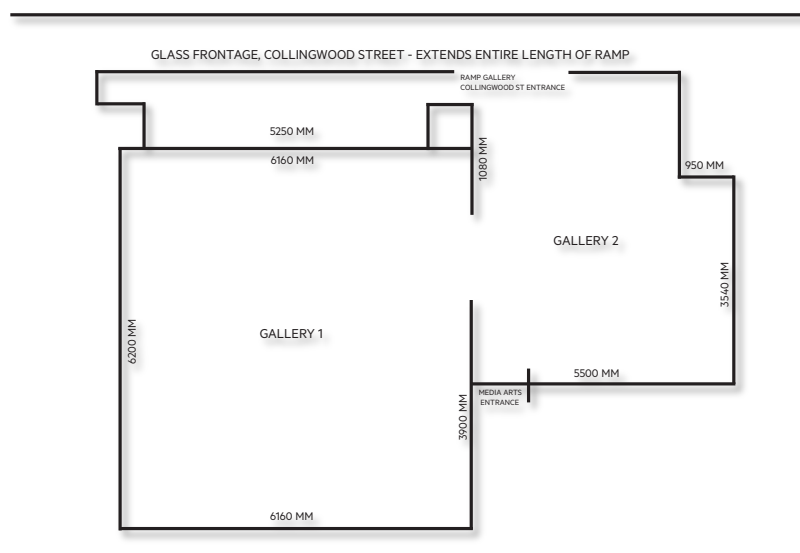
Ramp Gallery floor plan. Source: Ramp Gallery, used with permission.
